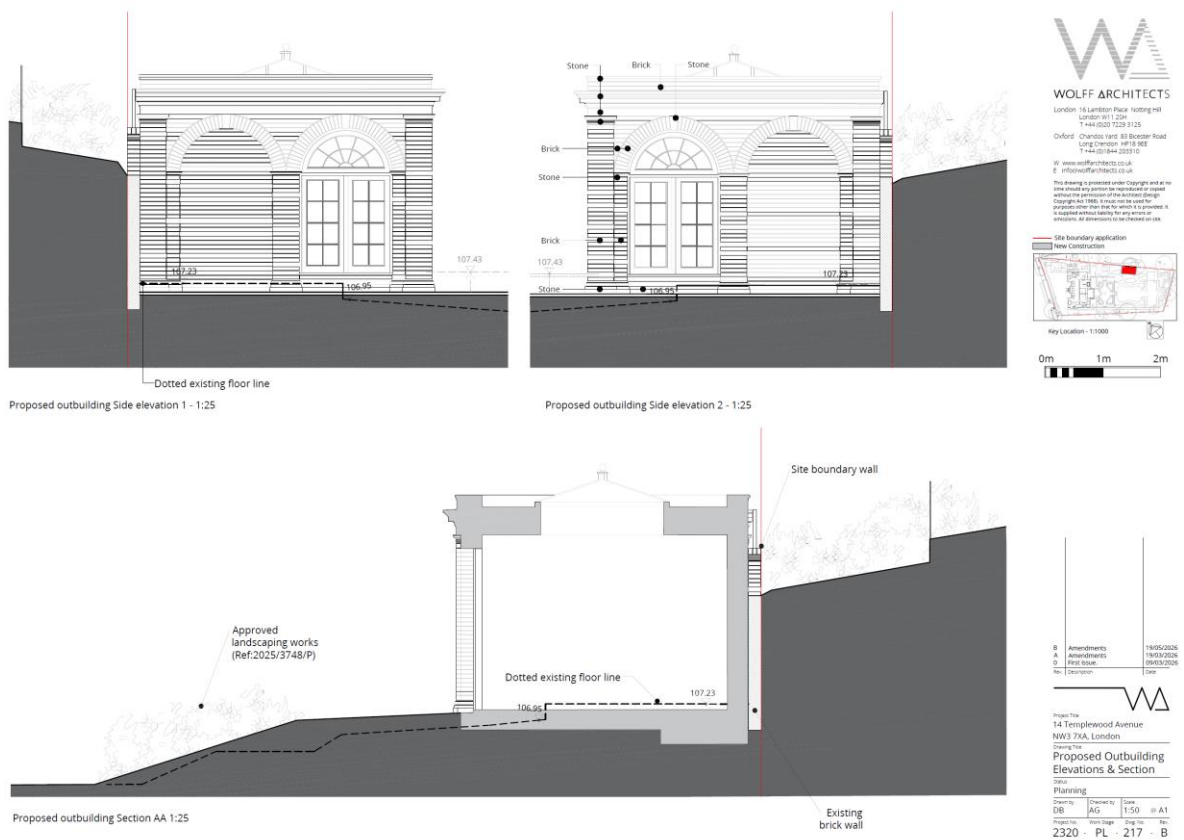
Proposed side elevations and section of the outbuilding (Source: submitted documents)
